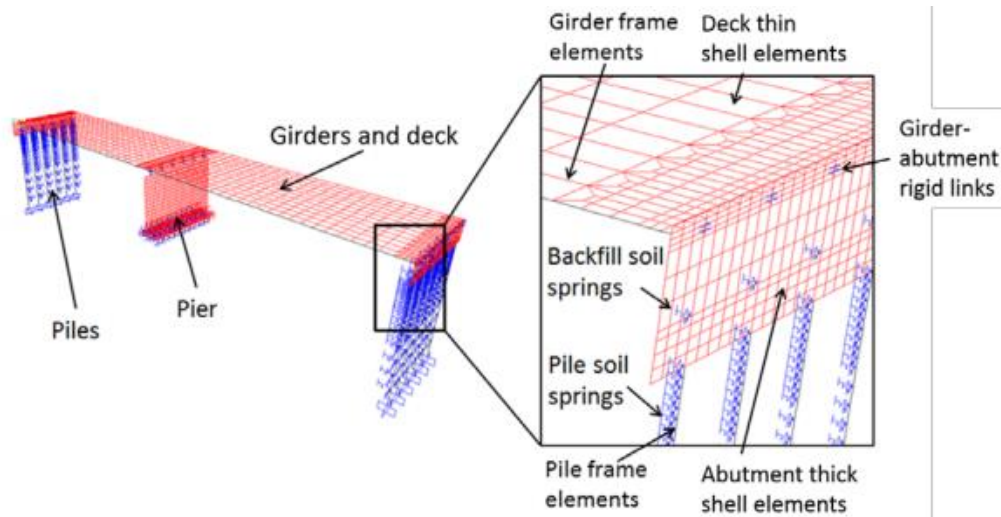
Finite element model of integral abutment bridge.* (LaFave, et al., 2016)
